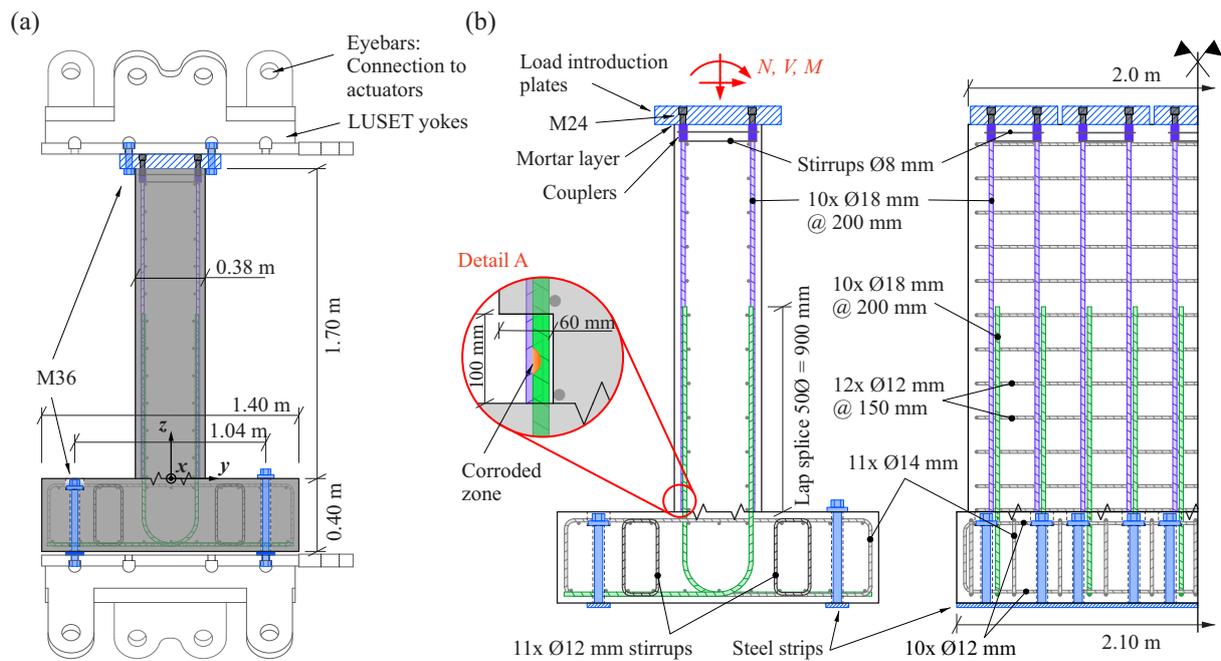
Drawings of test setup in the Large Universal Shell Element Tester (LUSET): (a) specimen dimensions, connection to LUSET yokes, and definition of the coordinate system; (b) reinforcement layout and detail of a reinforcing bar in the region of the corroded zone.
